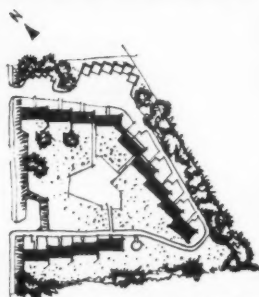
, 11 and 12. Housing layout, Viby. Scale, 1: 5,000. Right: a timber screen to a clothes-drying area among the pre-fabricated flat blocks. Below is a children's playground. Architect, C. K. Gjerrild. Landscape Architect, J. Arevad-Jacobsen
